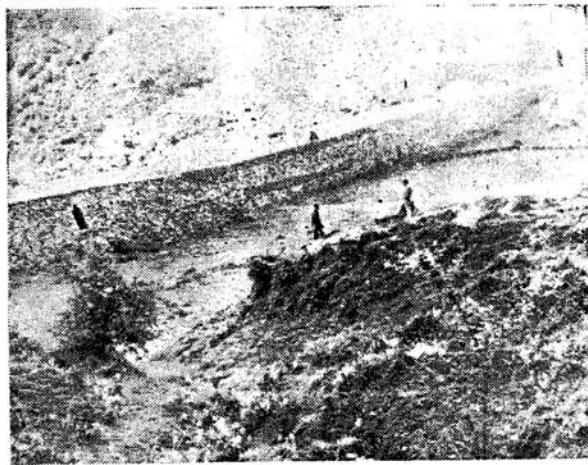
About 150 m long 6 to 7.5 m high dry stone masonry retaining wall, Road completely in filling, no necessity of expansion joints in dry stone masonry retaining walls
